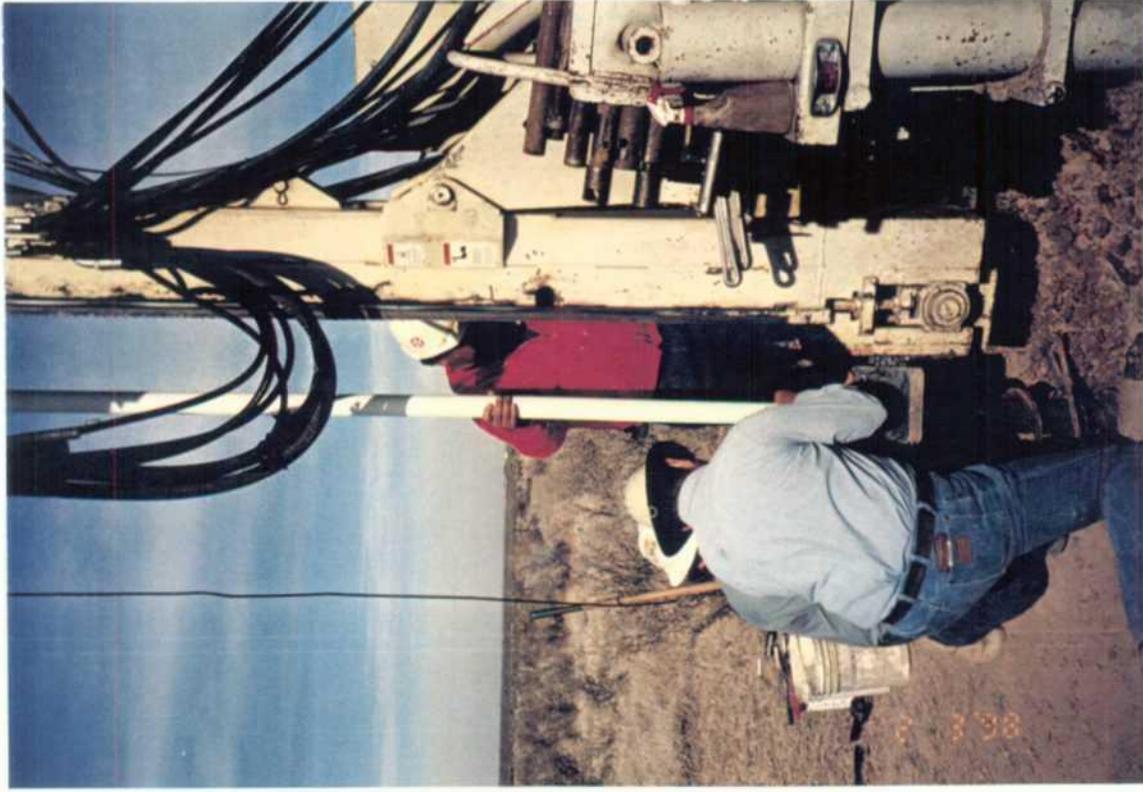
Boring B-5 (MW-5), 30 - 35 feet (02-06-98).
